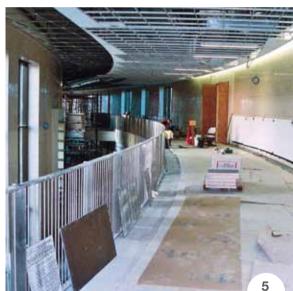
ULTRAFLEX LFT adhesive was used to lay 46x46 cm porcelain tiles on walls and columns of several bathrooms. Joints were grouted with OPTICOLOR. Photos 5 and 6. In the atrium porcelain tiles were laid on the curved walls with ULTRAFLEX LFT, before grouting joints with OPTICOLOR. Photo 7. In the auditorium natural stone slabs were laid on the walls with ULTRAFLEX 3.
